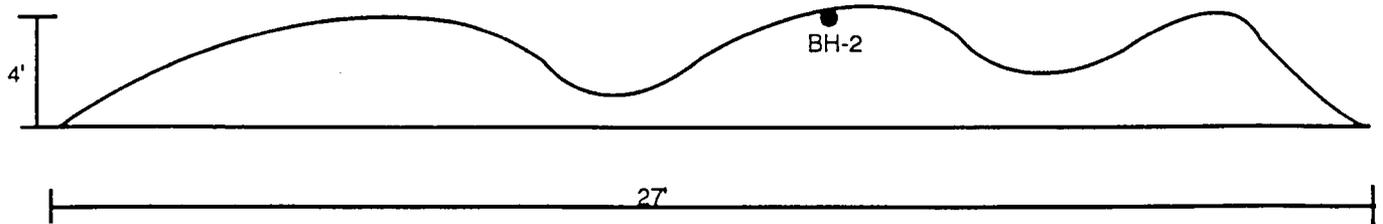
Elevation view of Soil Pile D depicting grid locations, Navy Fuel Farm at NAS Willow Grove, Horsham Township, PA.
